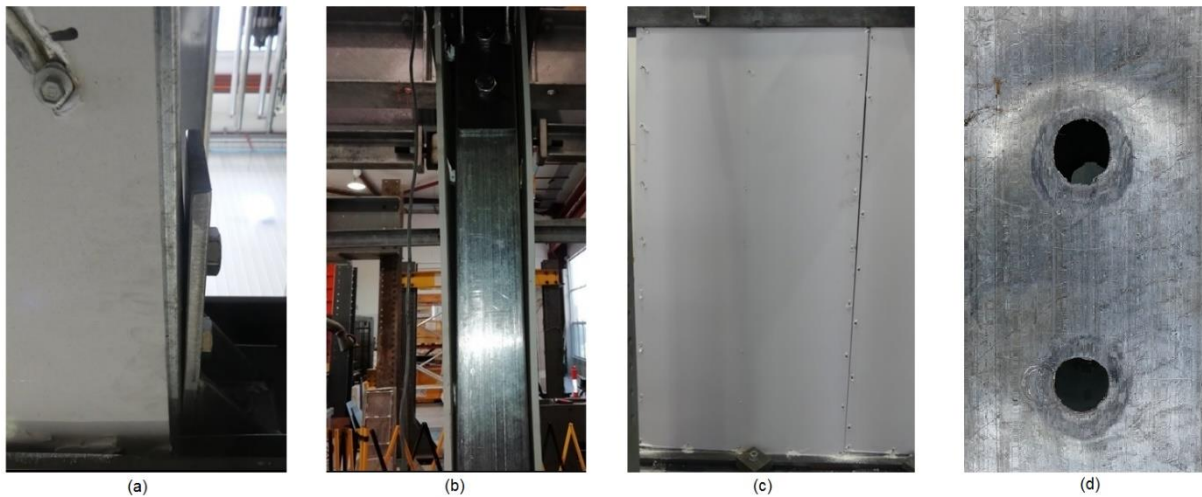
Failure modes for specimen HW7: a) bearing failure, b) screw pull-through sheathing, c) Detachment of the GWB d) buckling of SHS
